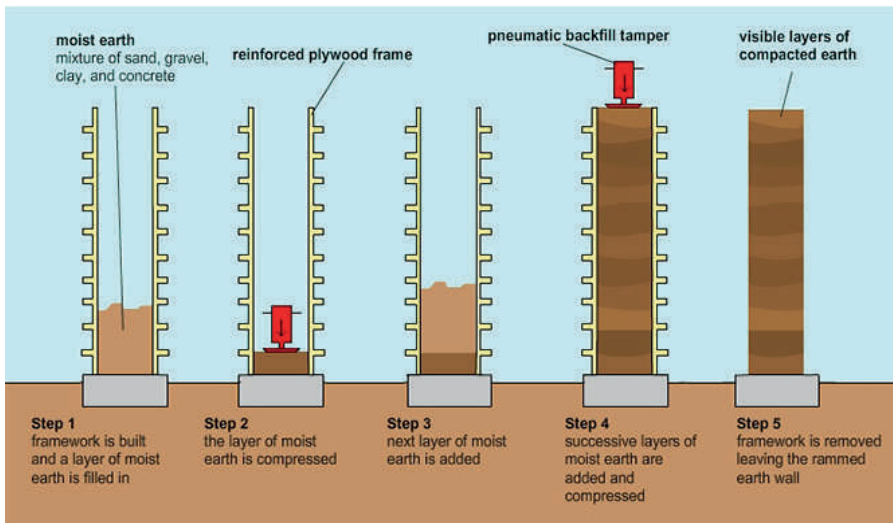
Rammed Earth Compacting Stage (“Green Building Design - Rammed Earth,” 2023)
